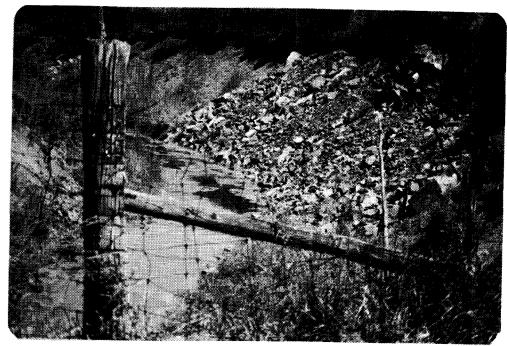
DRAIN MAINTENANCE - BANK STABILIZATION WORKS
